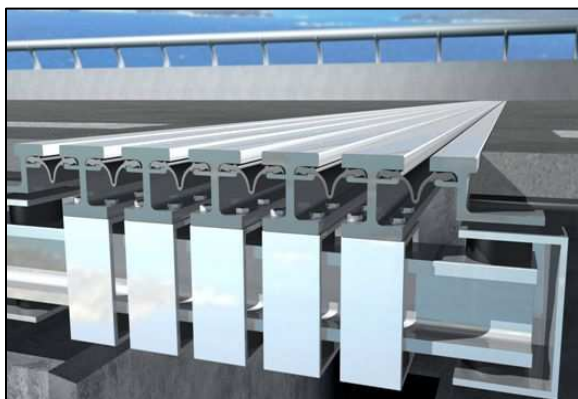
Section through a modular joint, showing its build-up (illustration)
